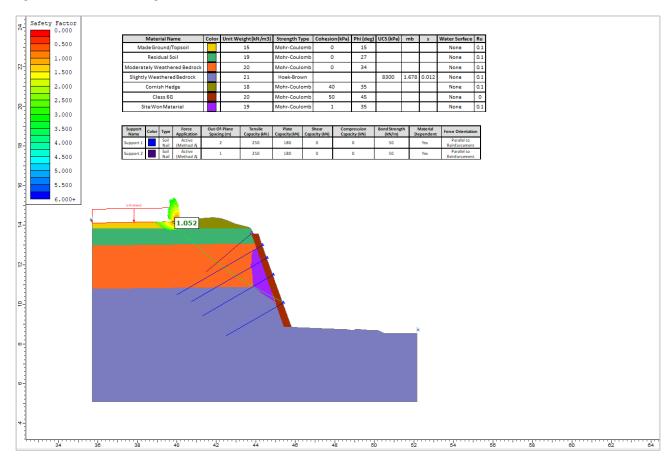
Section 3 – Facing Installation - BS8006 Set2
